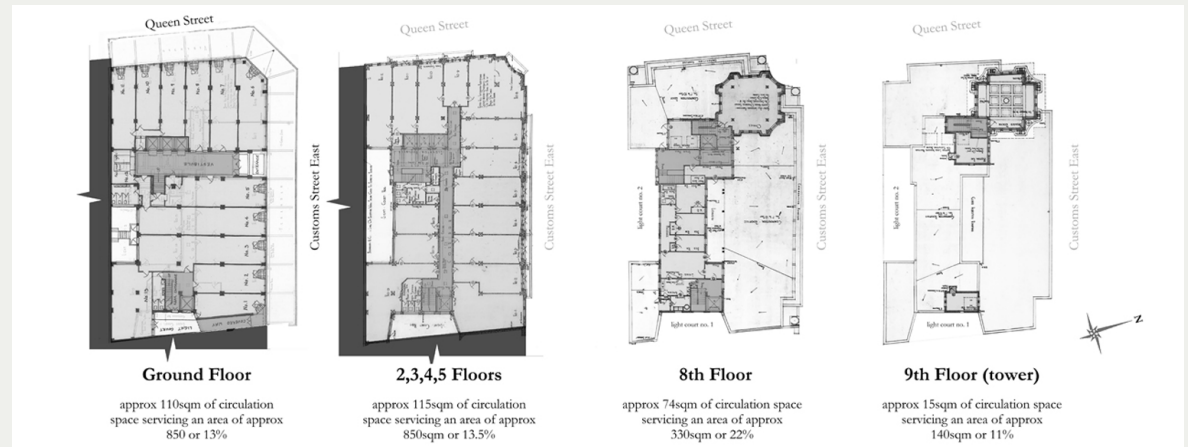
Selected floor plans illustrating circulation, ventilation and sunlight access of the Dilworth Building, Gummer & Ford Collection, GF33, Architecture Archive, Libraries and Learning Services, University of Auckland.
